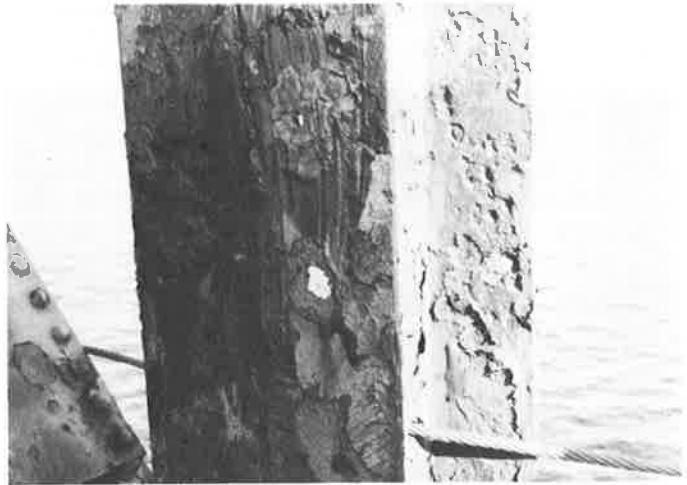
Corrosion Penetration of Riveted Hanger Components
